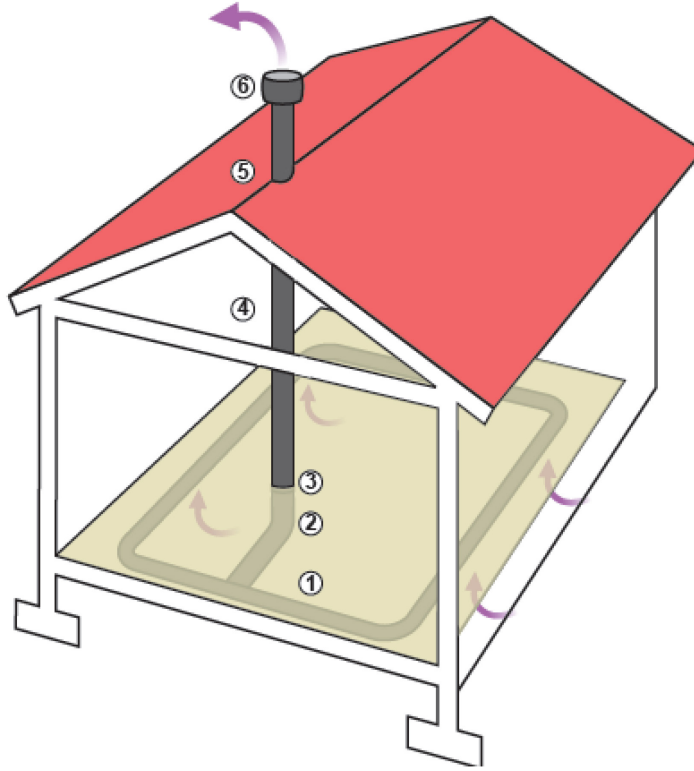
Air-ventilation system under the base floor (1=drainage pipe, 2=sewer pipe, 3=sealed through hole in the base floor, 4=insulated sewer pipe, 5=water tight sealing in the roof, 6=Rain hat or if necessary electrical fan) (Arvela et al, 2009).
